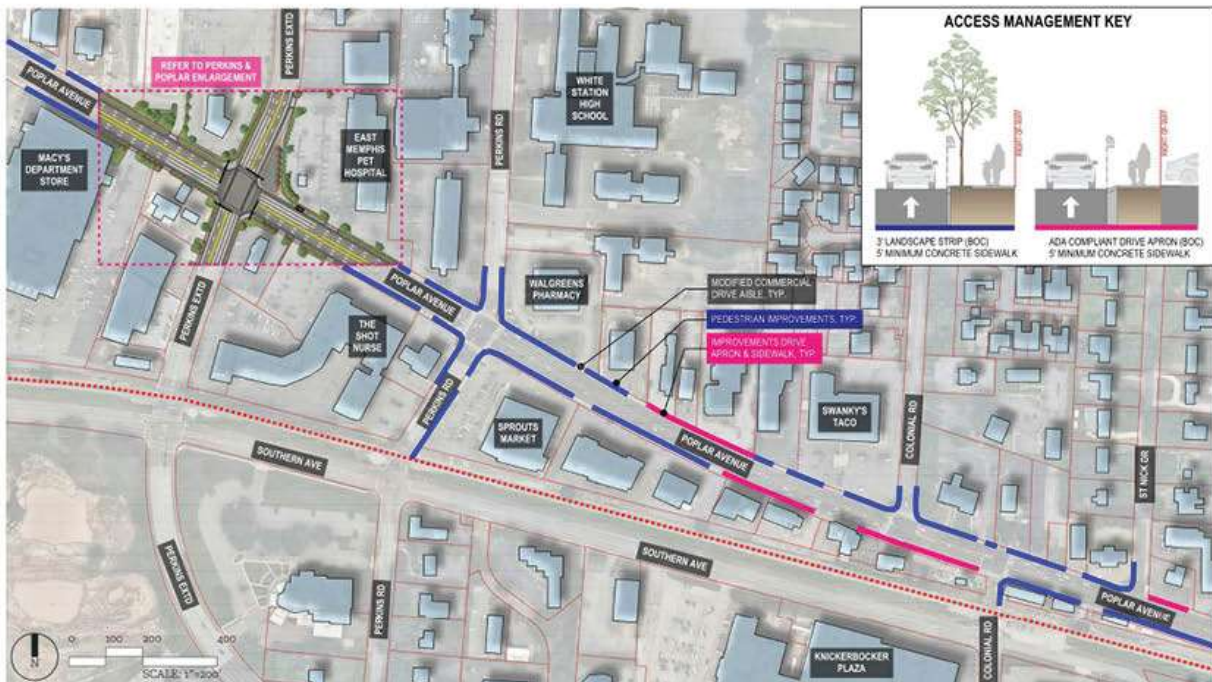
Perkins Extended to Colonial Road Existing Aerial and Concept Plan
